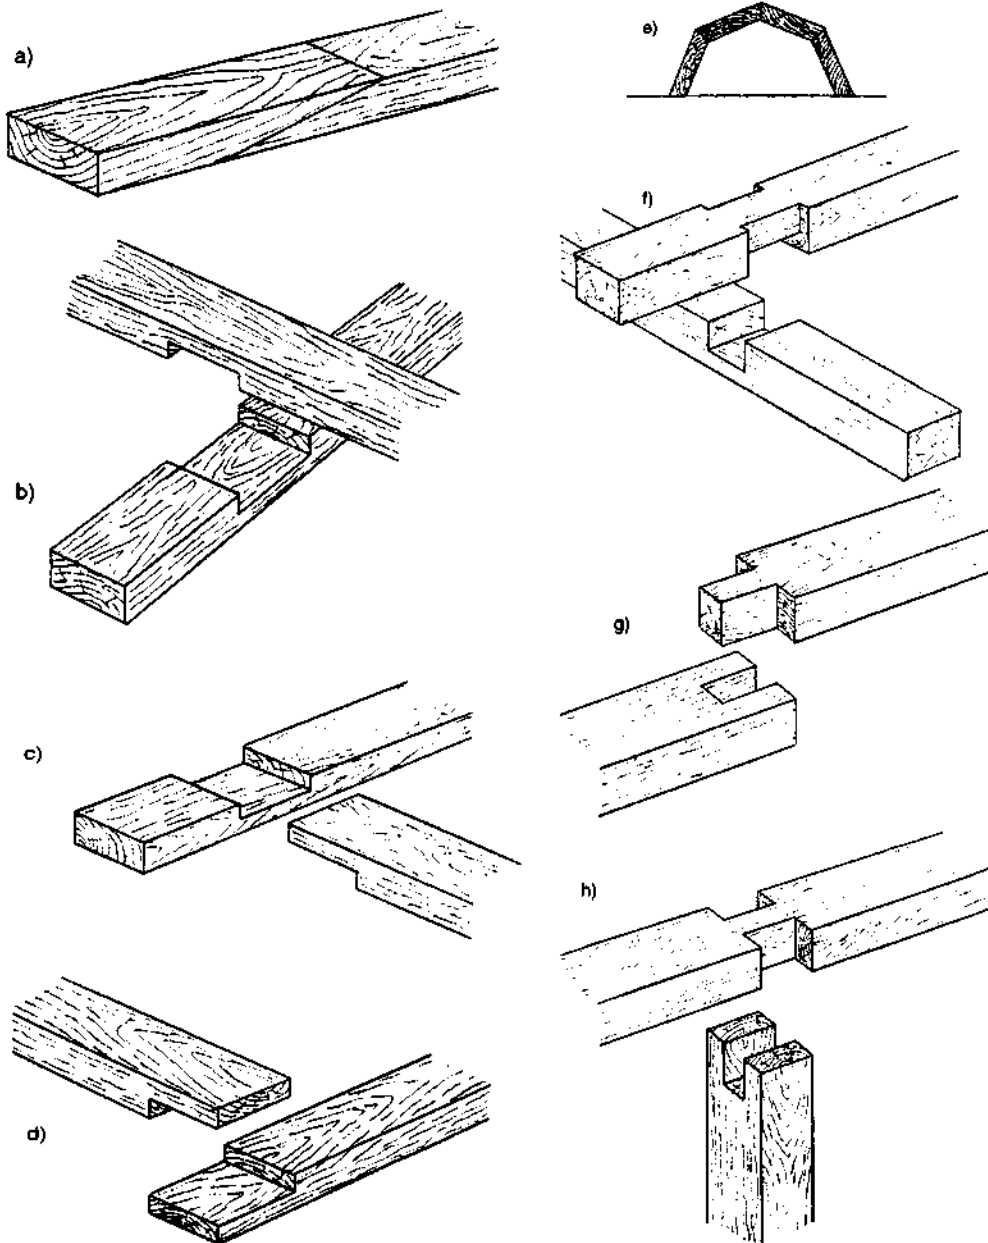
C8 Scarf, lap (halved), bevel, and bridle joints: a), scarf joint, b), middle lap (halved) joint, c), T-lap (halved) joint, d), end lap (halved) joint, e), bevel joint, f), g), and h), bridle joints.
